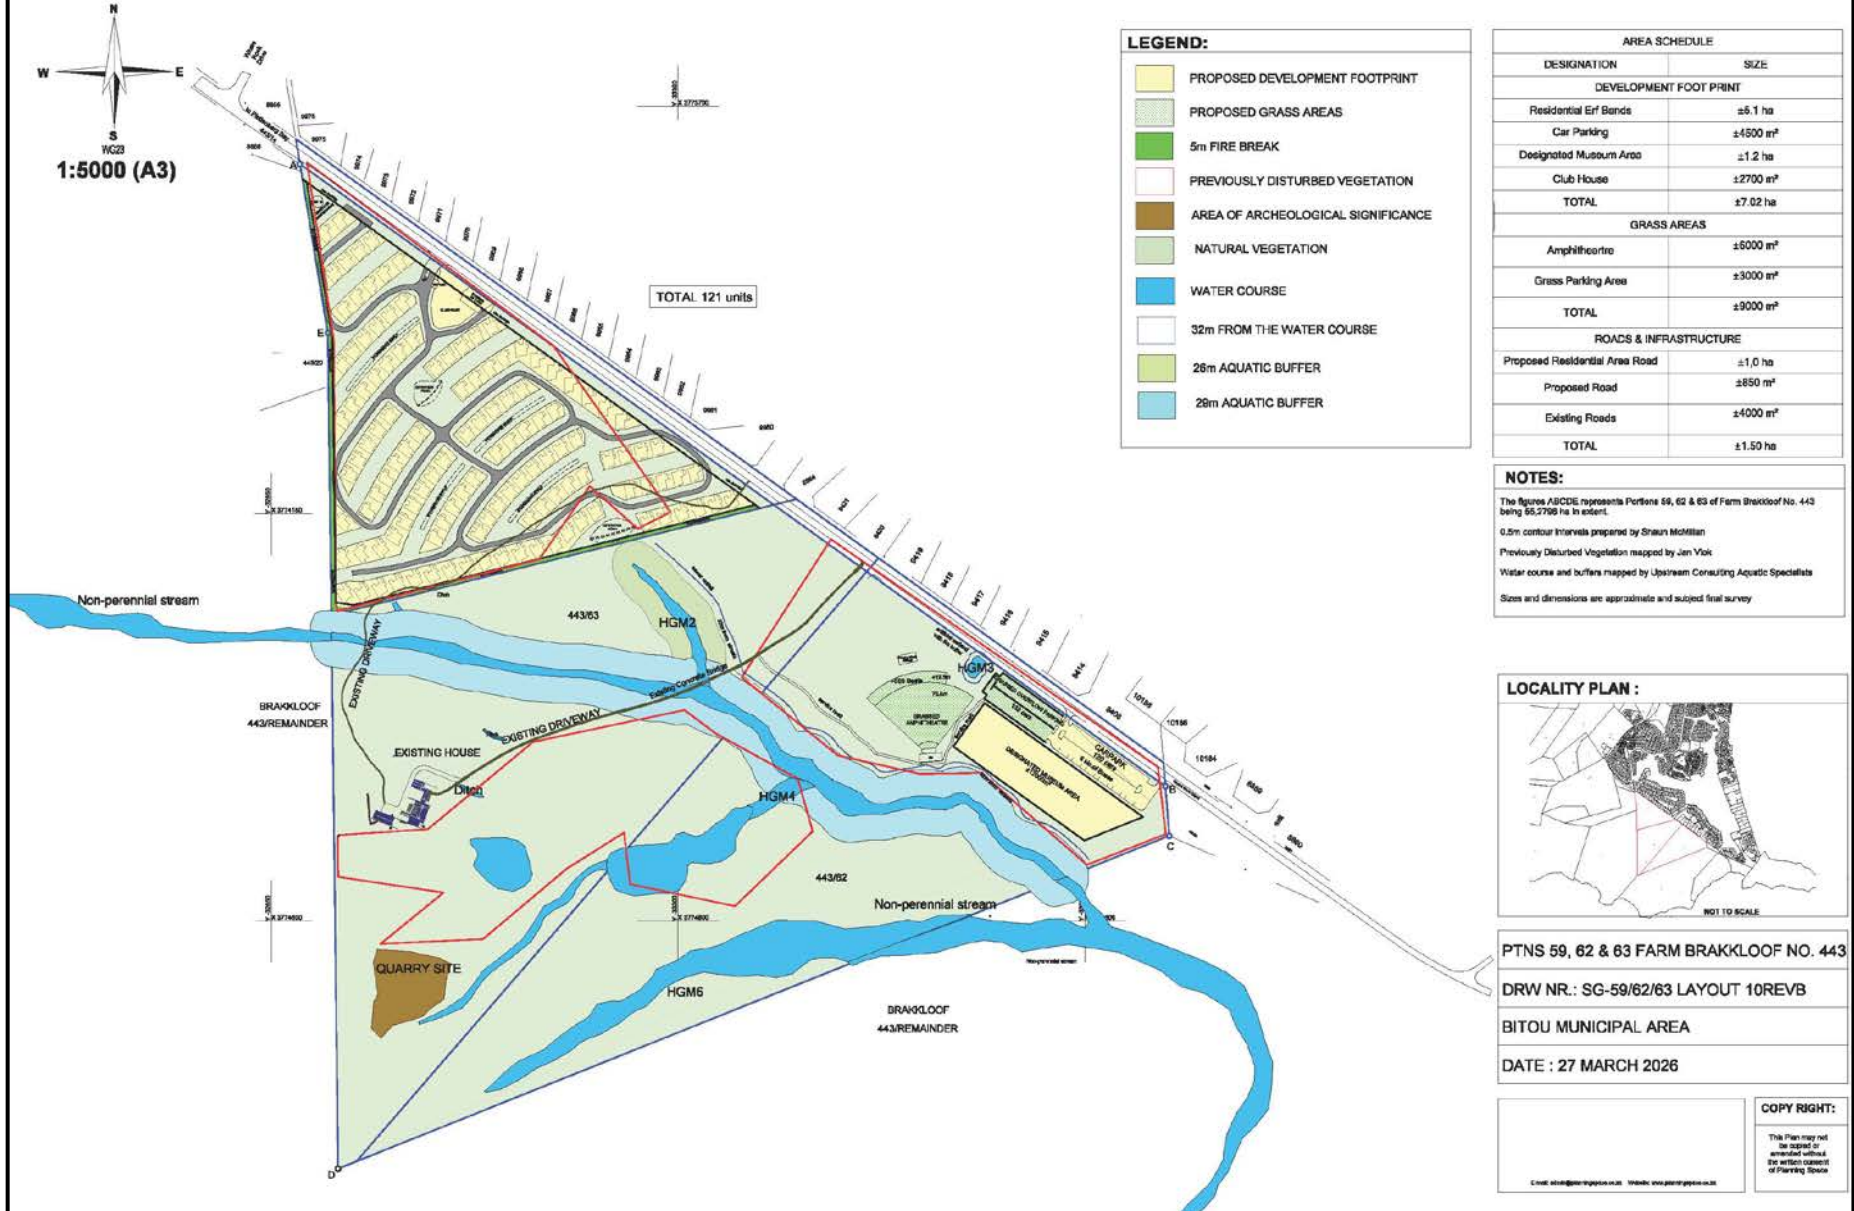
Proposed Site Development Plan (Planning Space, March 2026)
